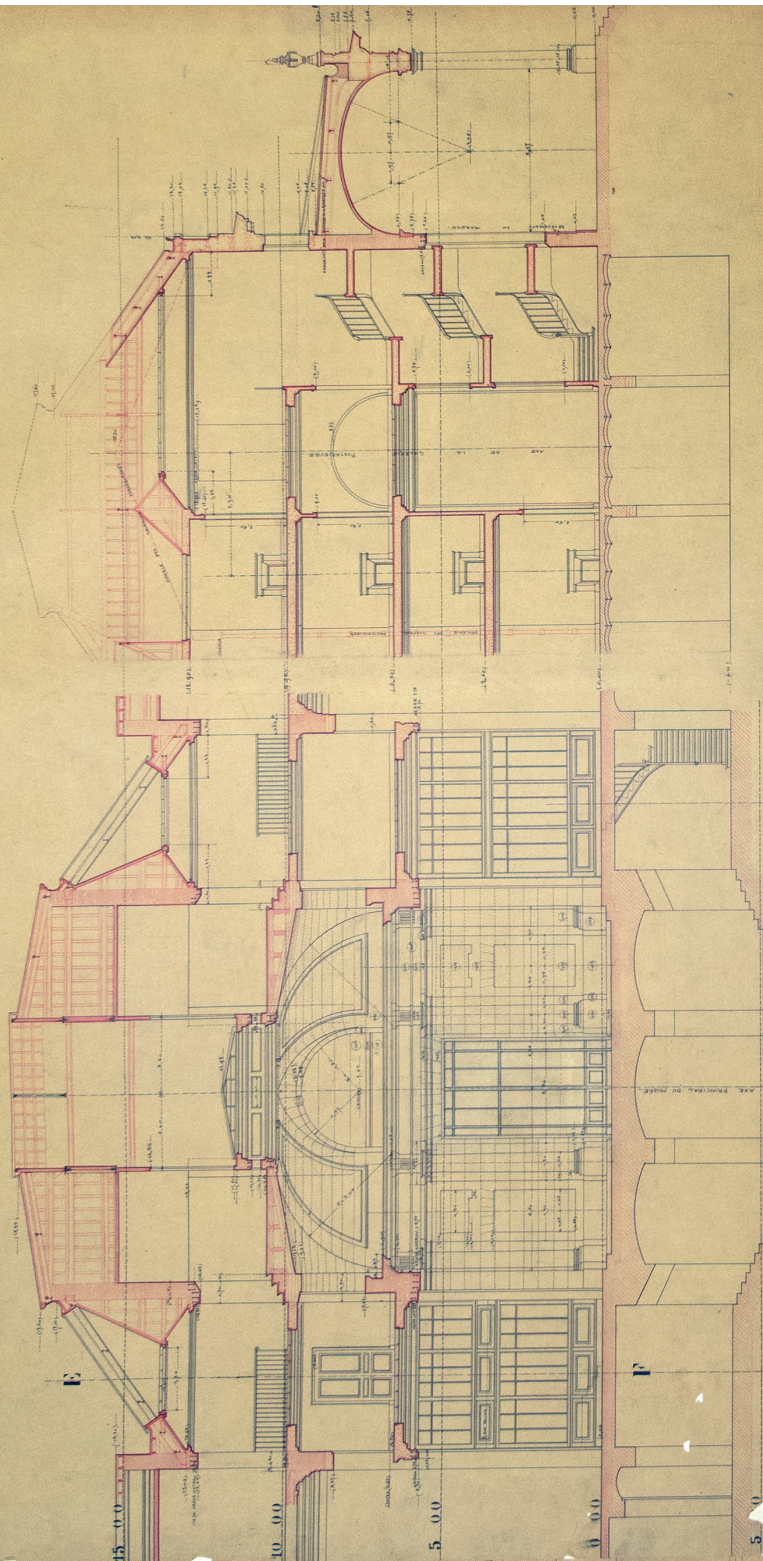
Plate III. Rear façade. Vault of the main hall. Original scales: 1/50 (left part of the drawing) and 1/20 (seccion AA, right side of the drawing). Dated 26 June 1905 (Drawing no. 177, HA.01.0827.20, RMCA Tervuren collection, Charles Girault archives). Note on section AA the composition of the vault, with one layer of bricks flatwise, and two layers in a radial position.
